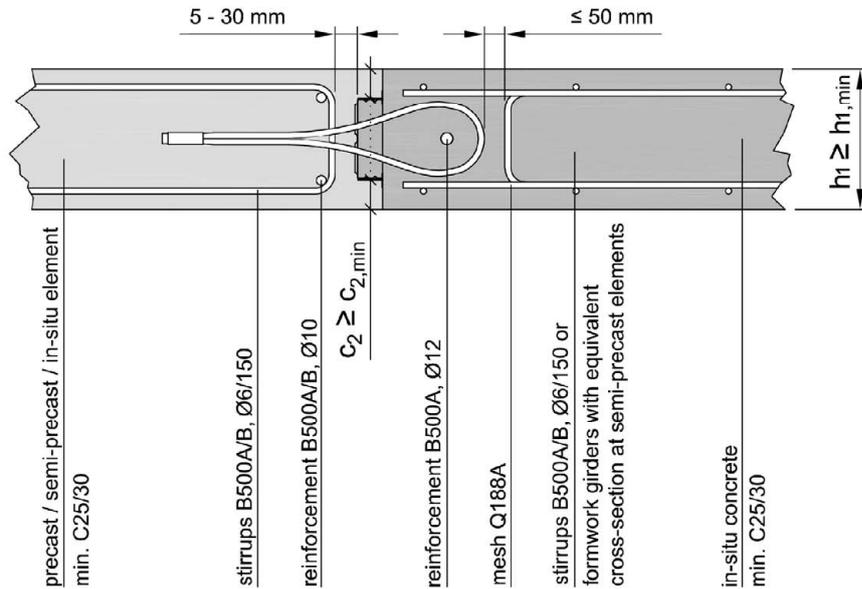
Standard detail (cross section) with in-situ concrete supplement, reinforcement
